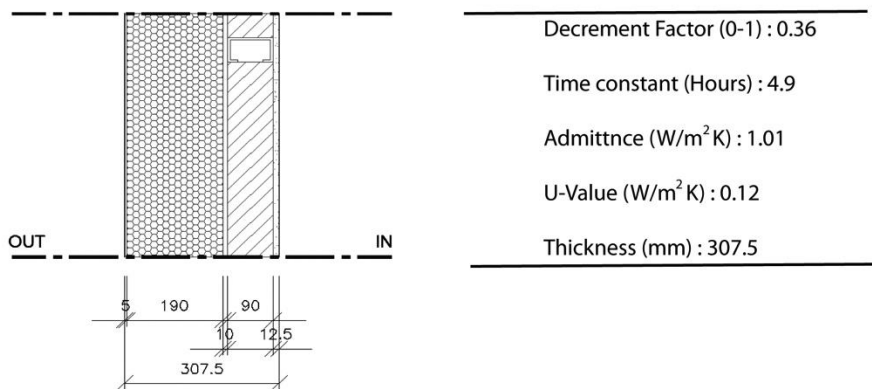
From out to in: 5mm Rendering, 190mm Extruded Polystyrene (EPS), 10mm Plywood, 90mm Rockwool, 12.5mm Plasterboard
